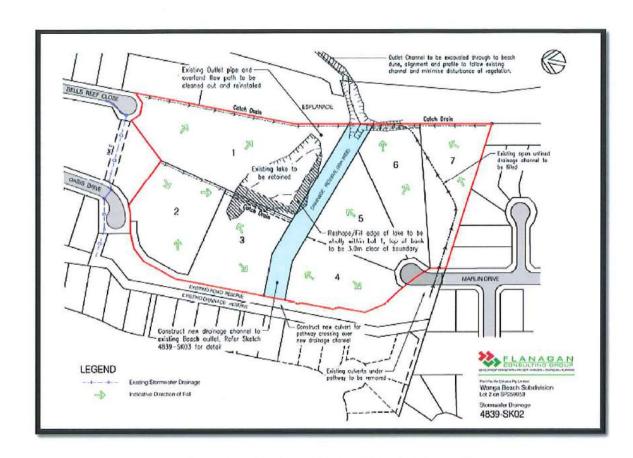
STORMWATER DRAINAGE (4839-SK02)
